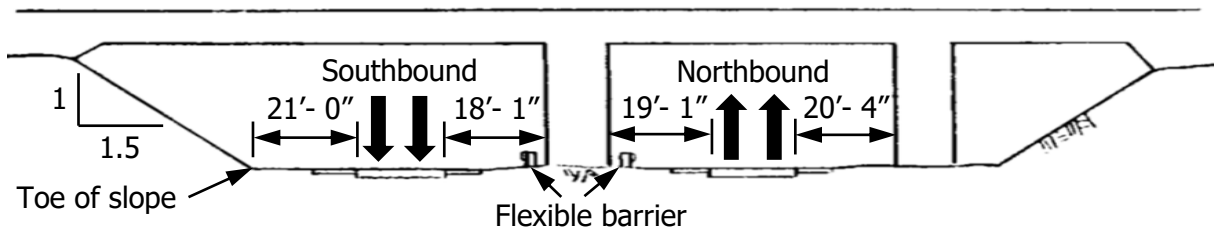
Bridge elevation view of horizontal clearances for separate southbound and northbound highway features below the bridge, with flexible barriers.
